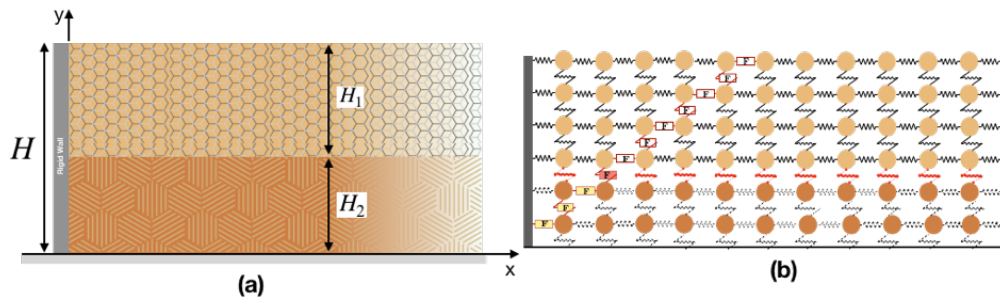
(a) Schematic presentation of a rigid wall on a rigid base retaining layered soil backfill material. (b) Generic concept of LIM with layered soil.
